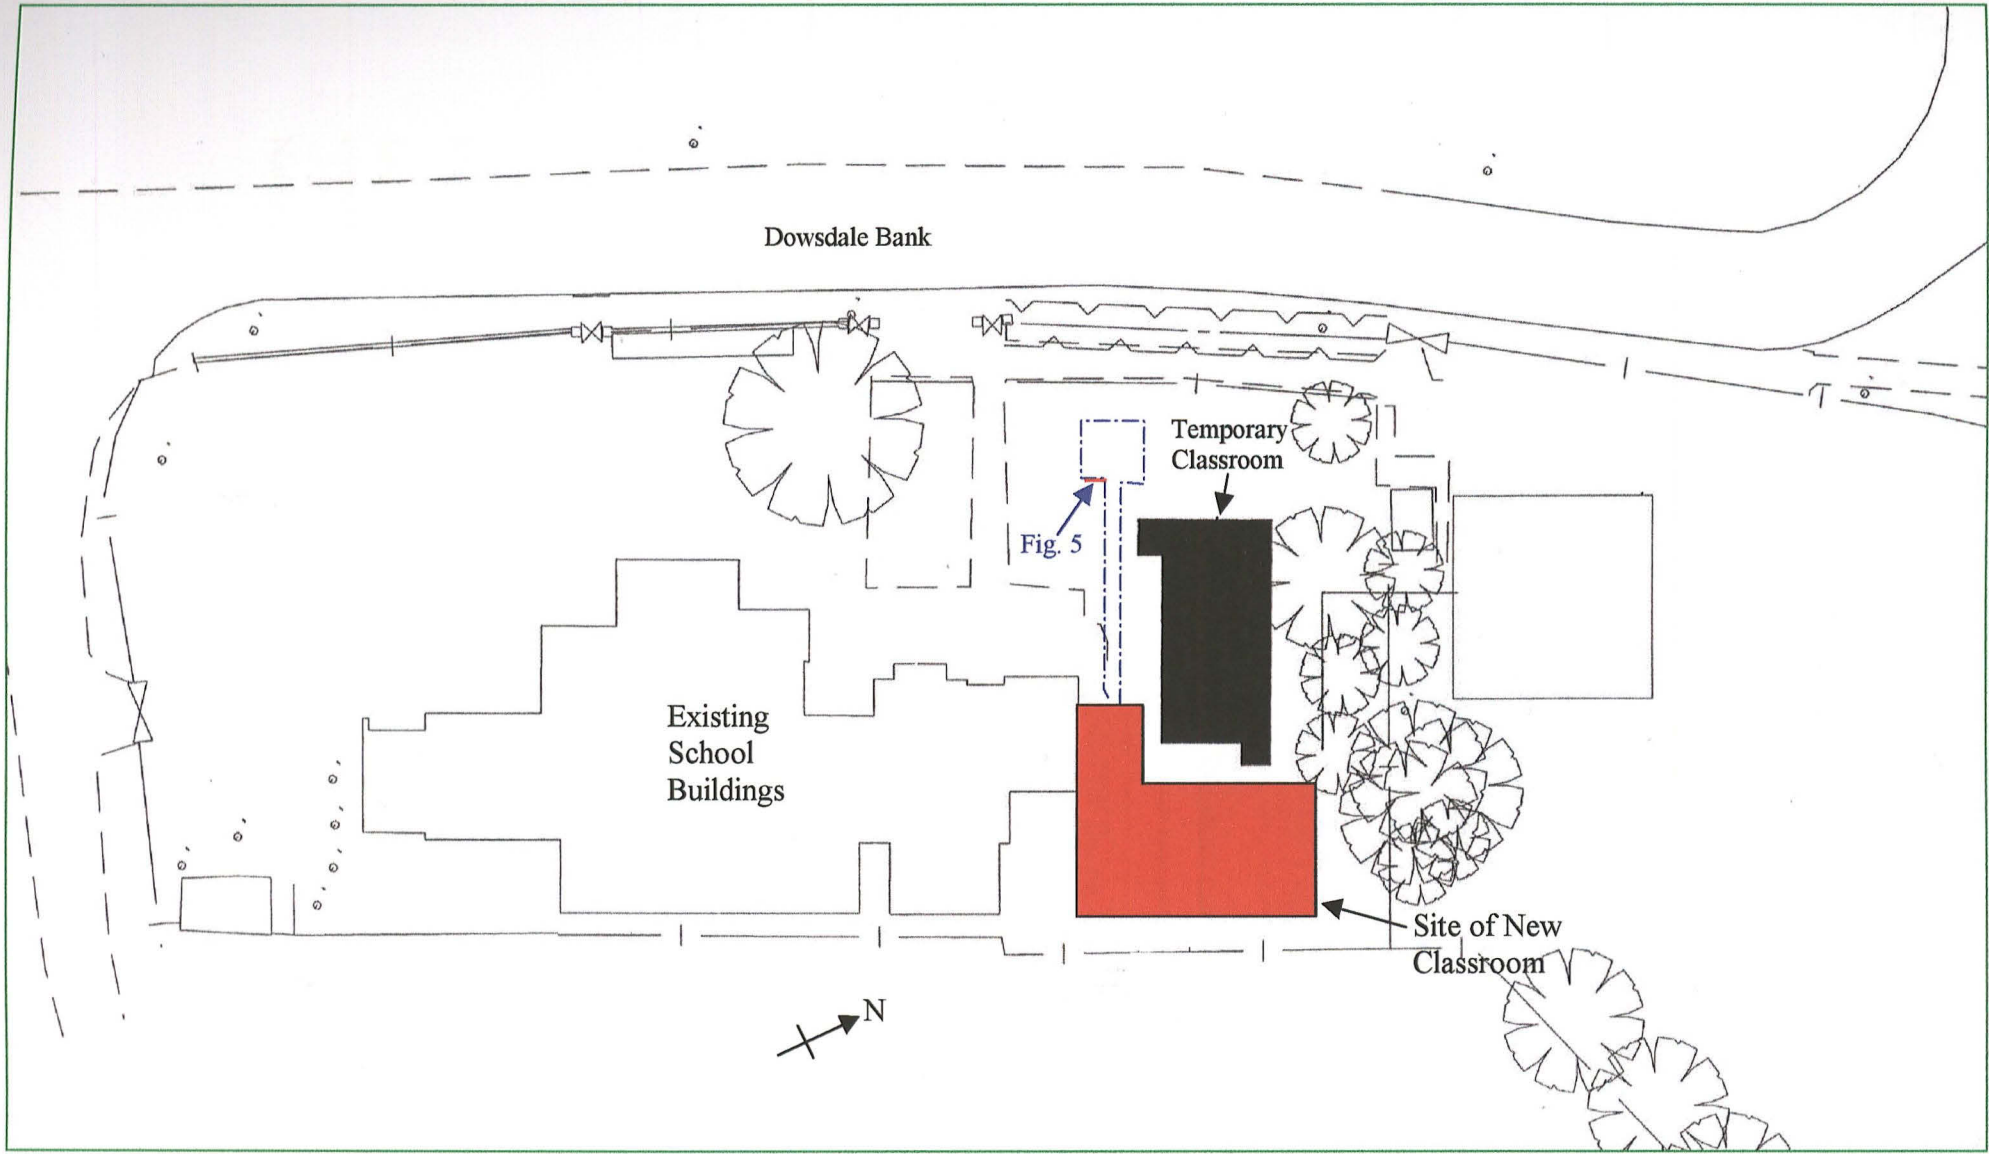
Plan of Shepeau Stow Primary School showing the development area in red. The blue dot-dash line represents the area excavated for the new septic tank and the drainage trench leading to it. The section illustrated in Fig. 5 is highlighted in red. Scale 1:400.
